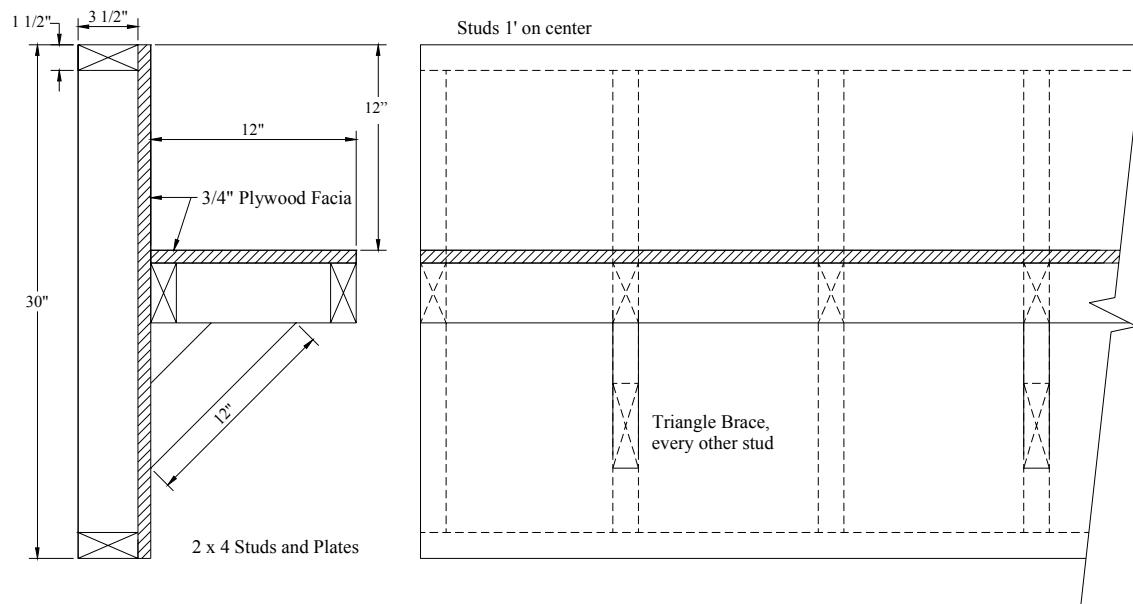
Typical exterior formwork panel used for MBISB 2.
